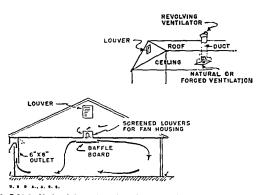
For blowing air from attic into laying house. Insert shows alternative arrangement, with fan mounted in ventilation shoot.
